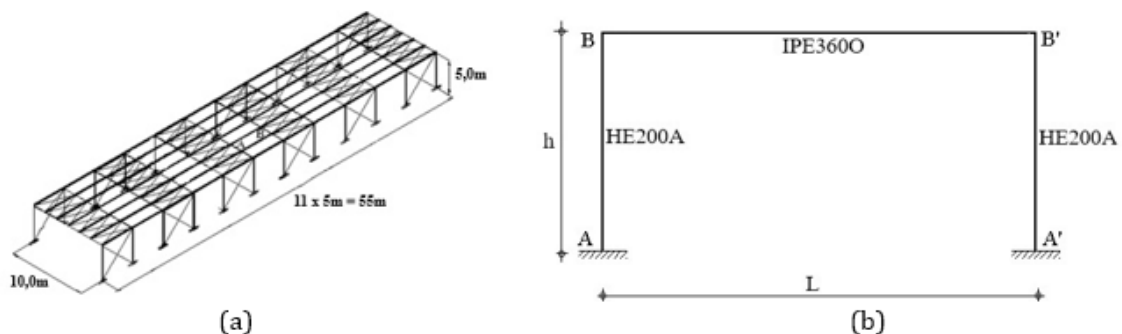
a) Steel structural industrial building, b) Steel portal frame.
